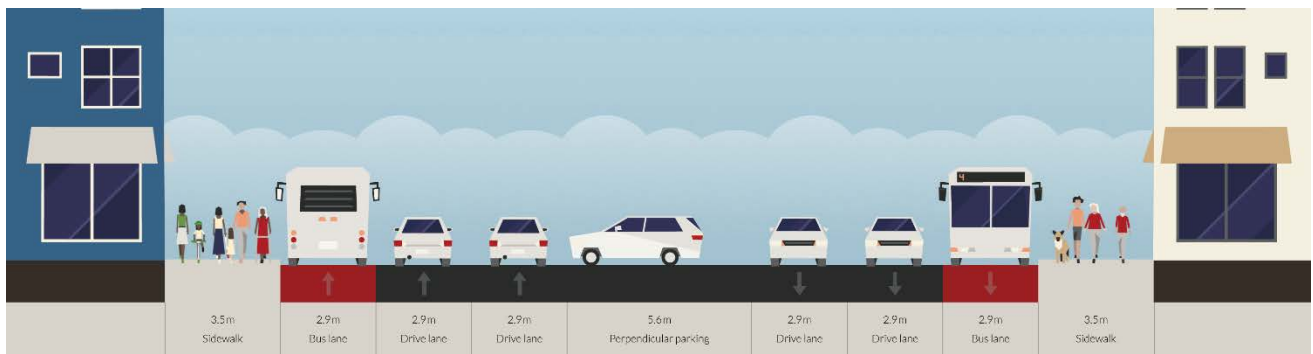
Example of a typical Lonsdale Street or Queen Street cross-section
